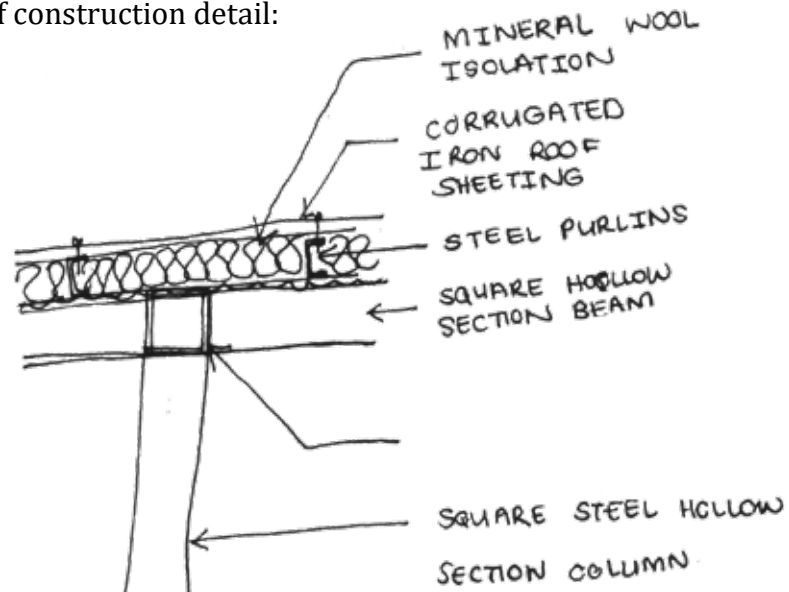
Steel roof construction with corrugated iron cladding (Caldeira, 2019: drawing).
